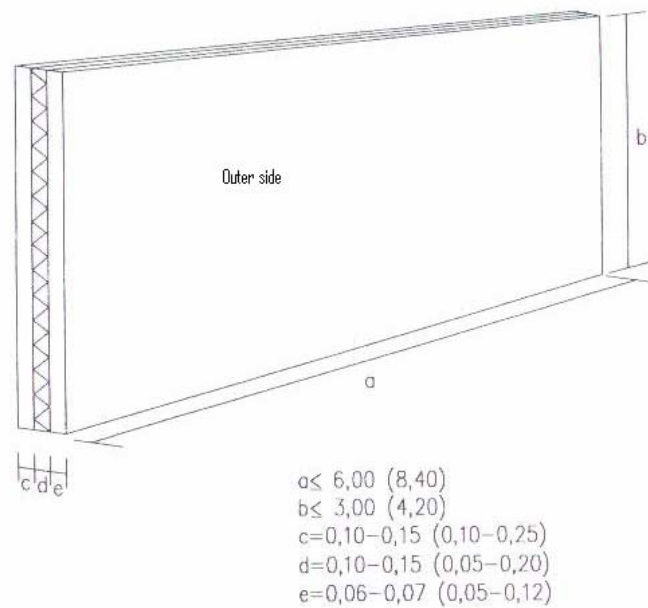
Sandwich element wall, bearing wall (dimensions in [m]). [28]
